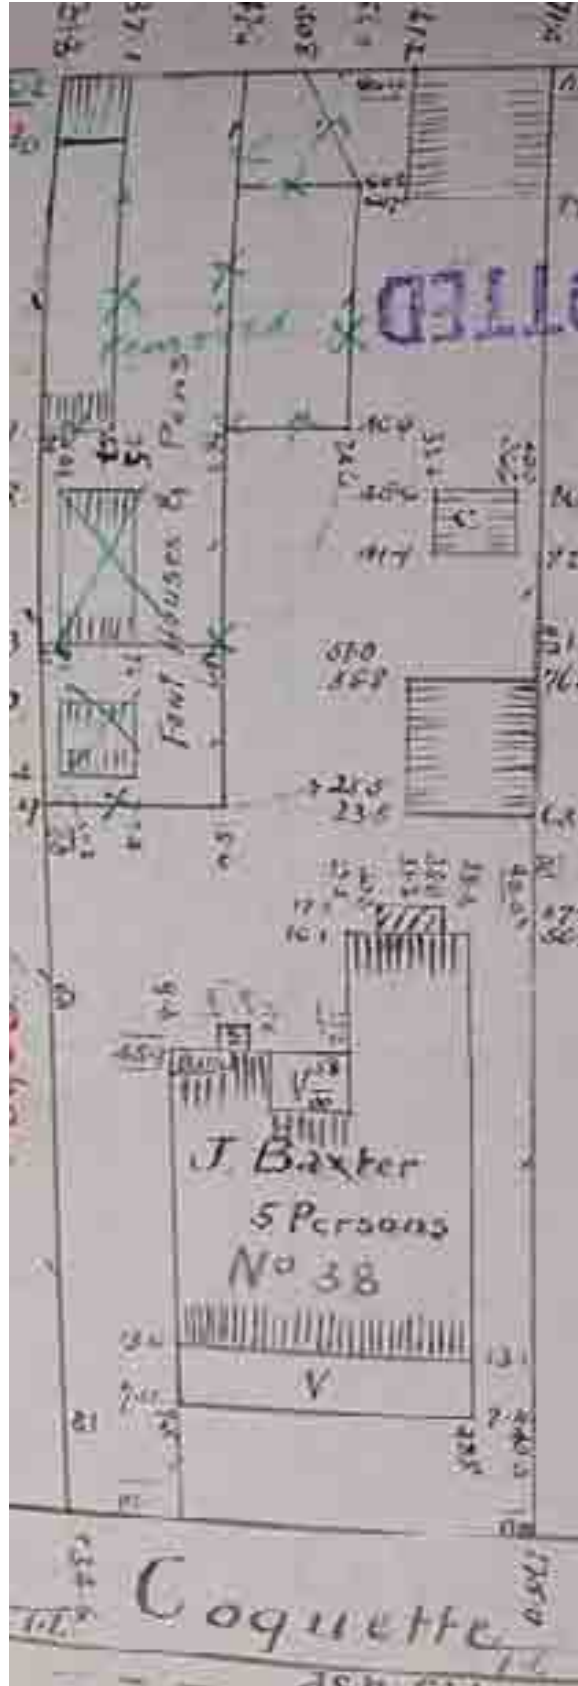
Sketch plan of the property at 38 Coquette Street, c.1913, showing the rear outbuildings including fowl houses. Source: Geelong Waterworks & Sewerage Trust Fieldbook plan, no. 163, p.6, c.1913, Barwon Water collection.
